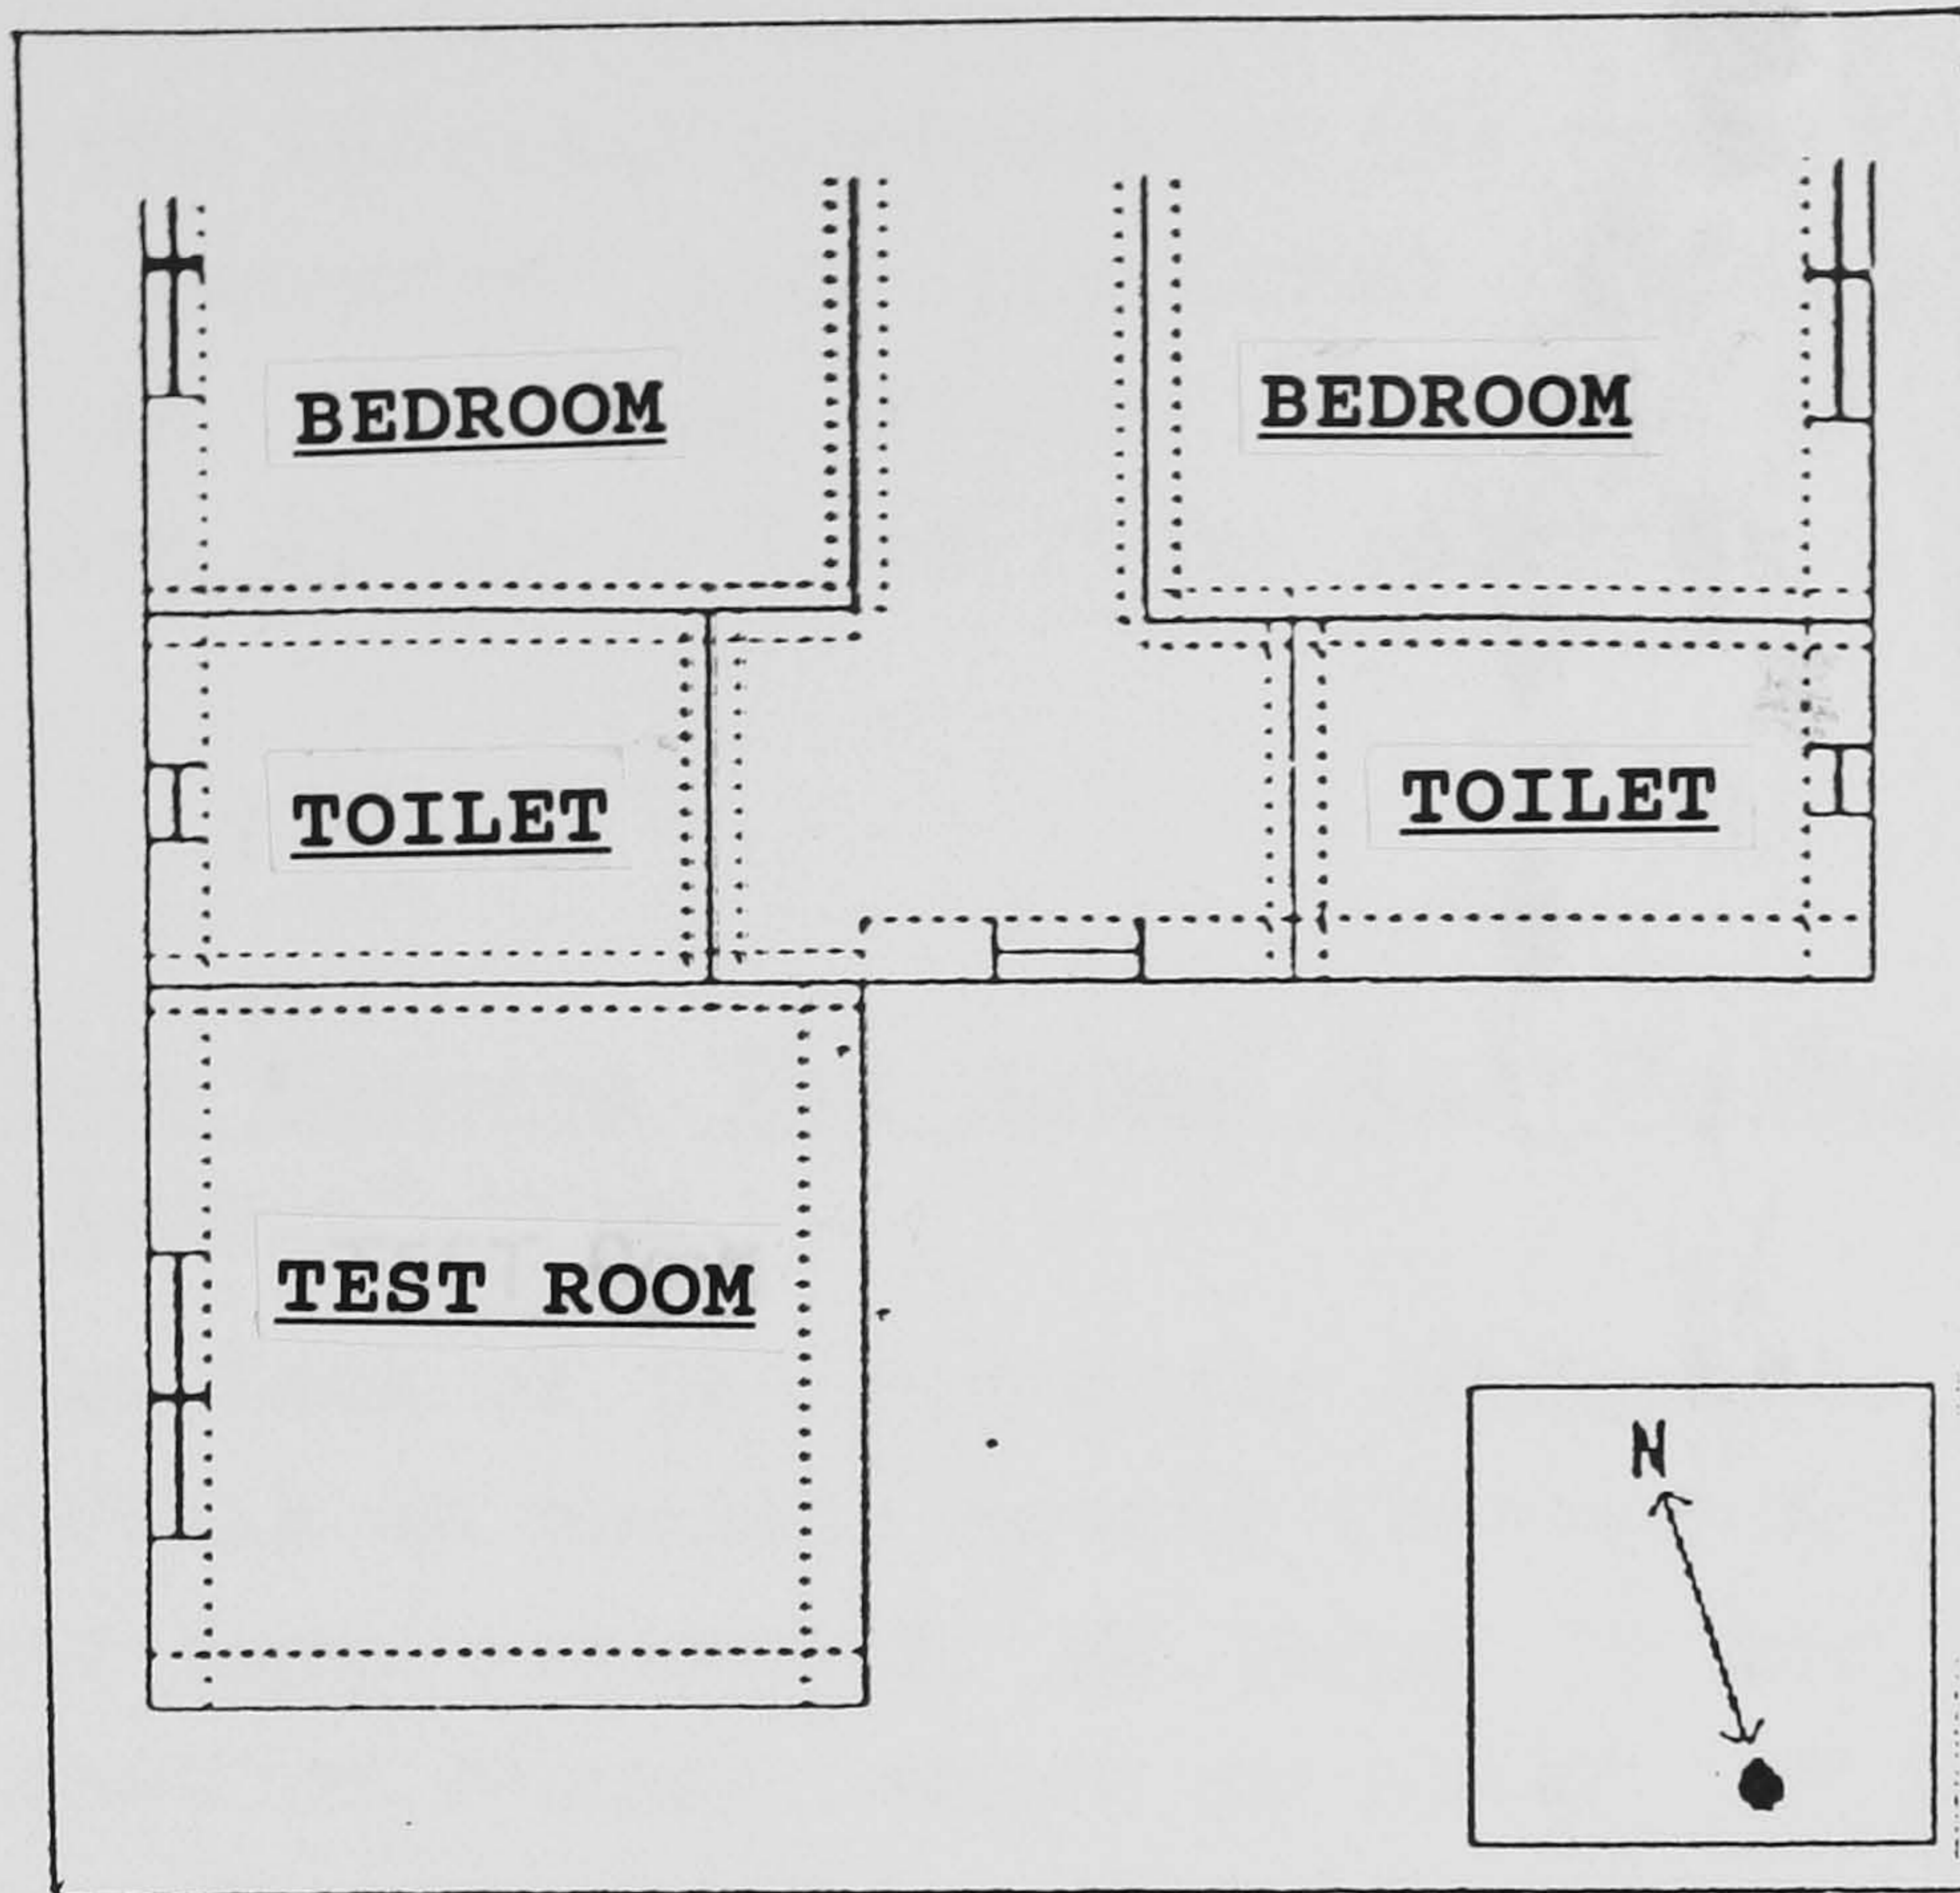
The lay out of the room used to validate the single-room model, with insulated roof and double-leaf insulated cavity concrete block walls.
